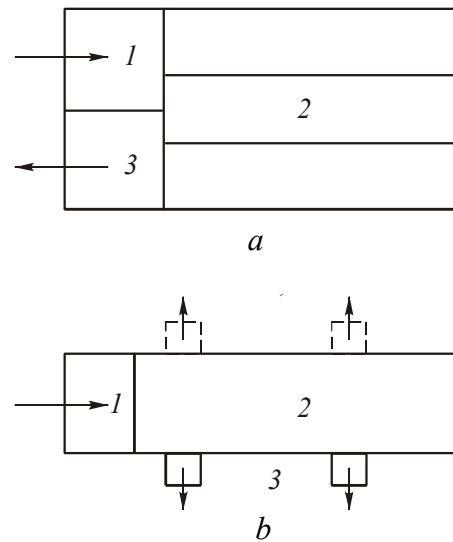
Variants of storehouse arrangements with areas for receiving 1, storing 2 and unloading goods 3: a – deadlock arrangement; b – twist-and-steer arrangement
